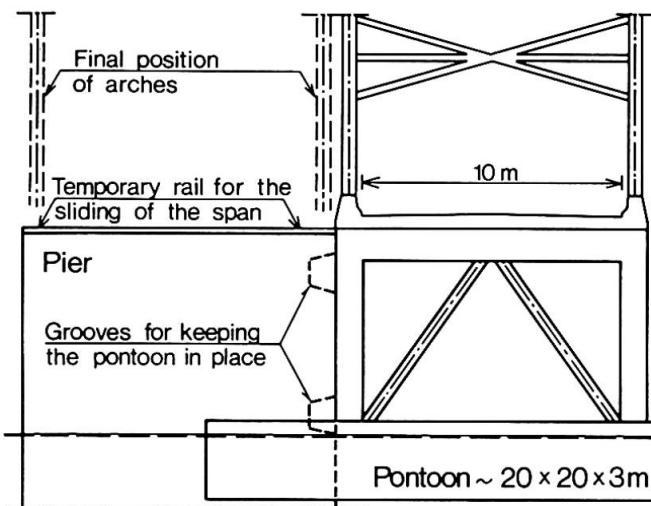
Pontoon and pier with the span on the pontoon ready for transfer.
